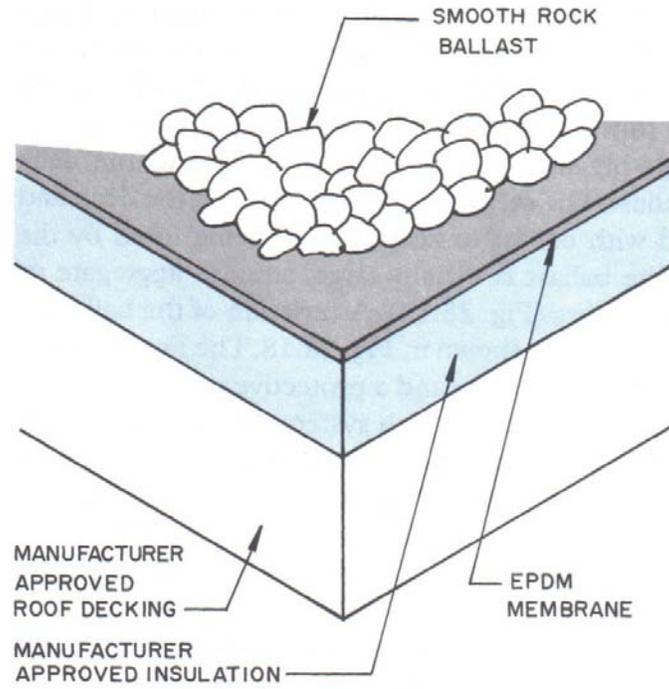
EPDM single-ply roof system detail (Spence, 1998)
